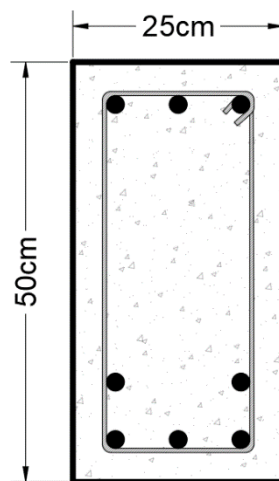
Beam cross section with 8 φ14 reinforcement continuous over the length. Stirrups: φ12@10cm c/c
